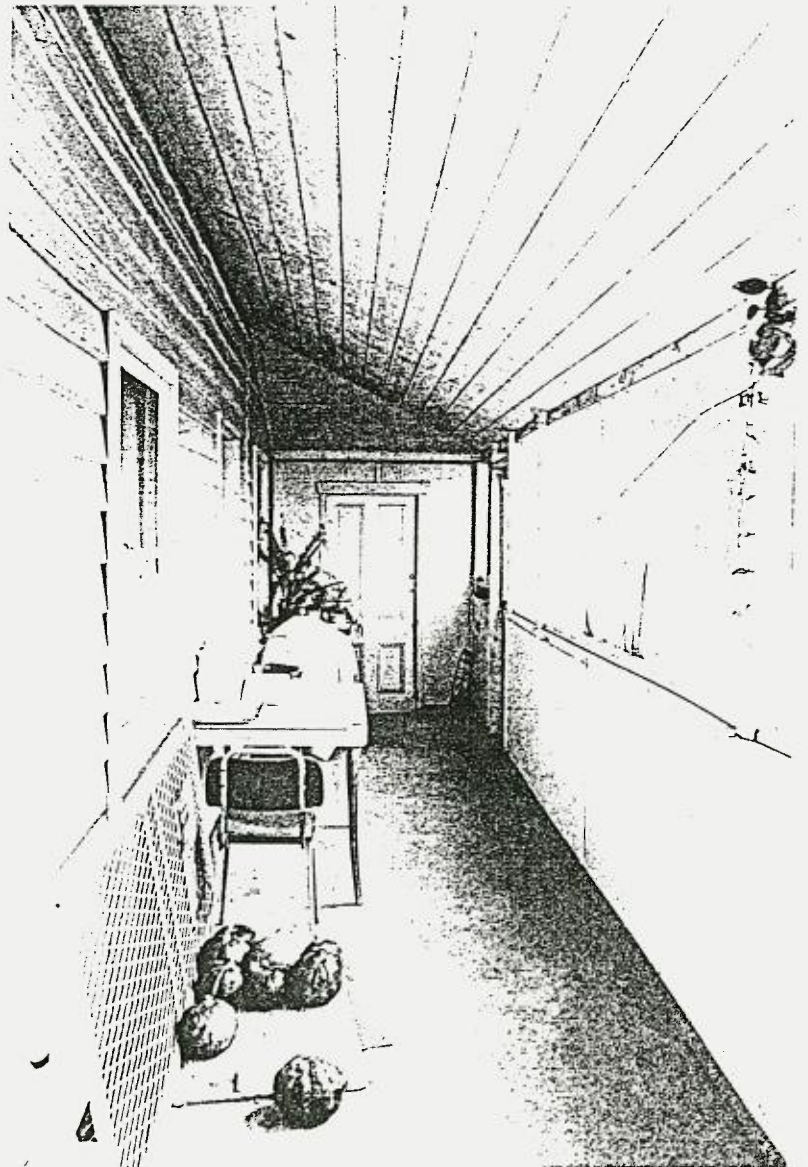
Phases 2 and 3 addition with continuous roof line over verandah but at reduced slope
